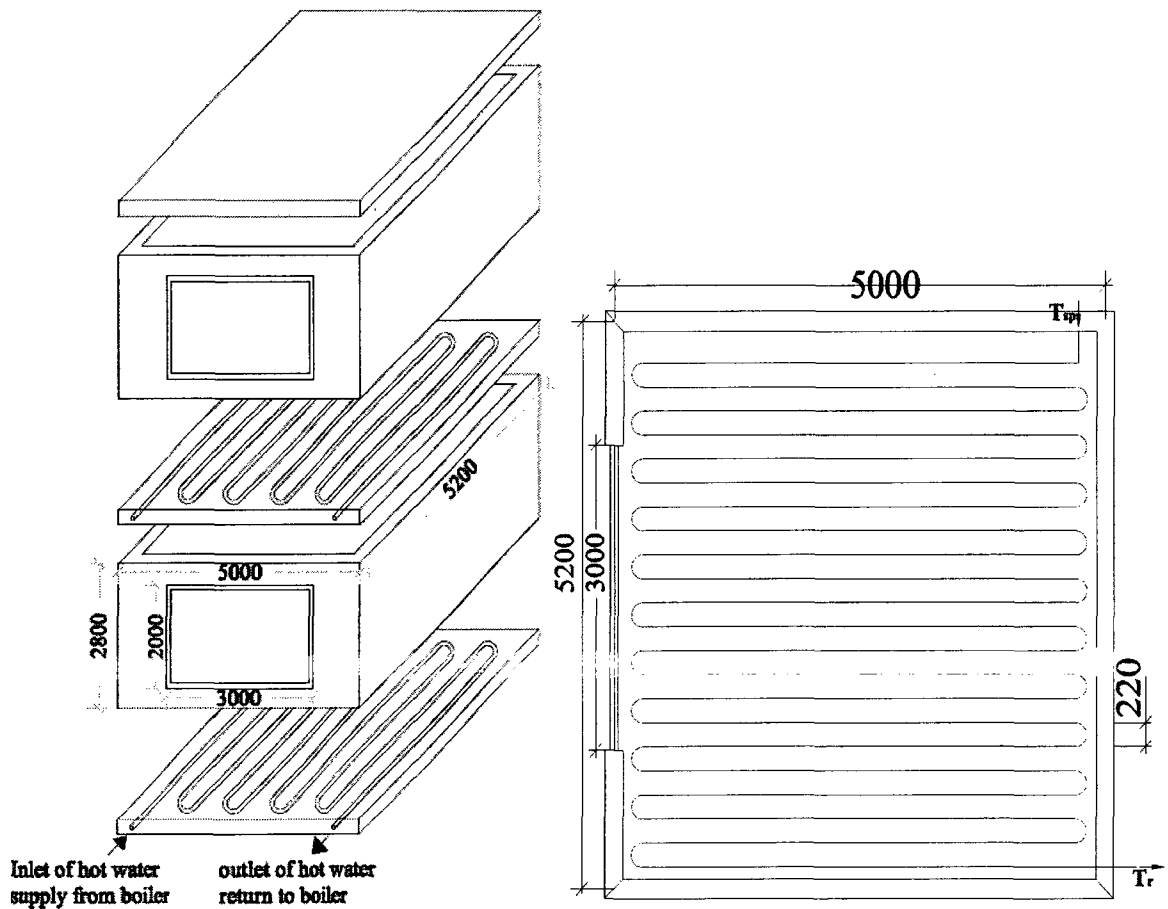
Elevation view and floor plan view of the single zone RFH system
